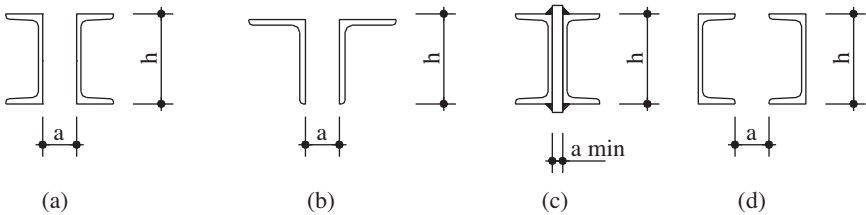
Built-up truss bars connected through (a) packing plates (b) star batted angles
